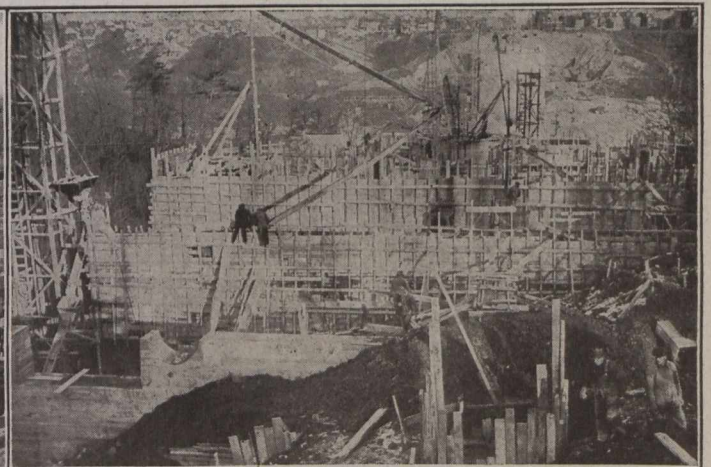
Looking East from the West Approach, Showing Form Work and Concreting Operations on Piers G and F.
